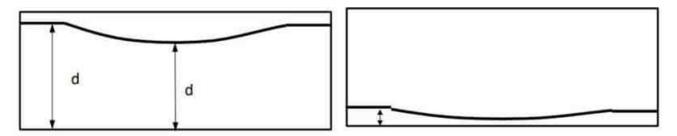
Reduction of Concrete Cover due to Reinforcement Movement
